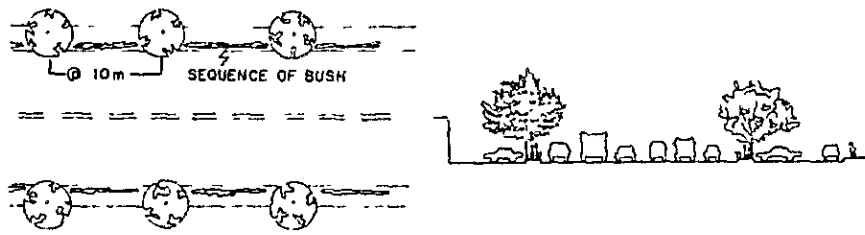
TYPICAL STREET PLANTING PATTERN
